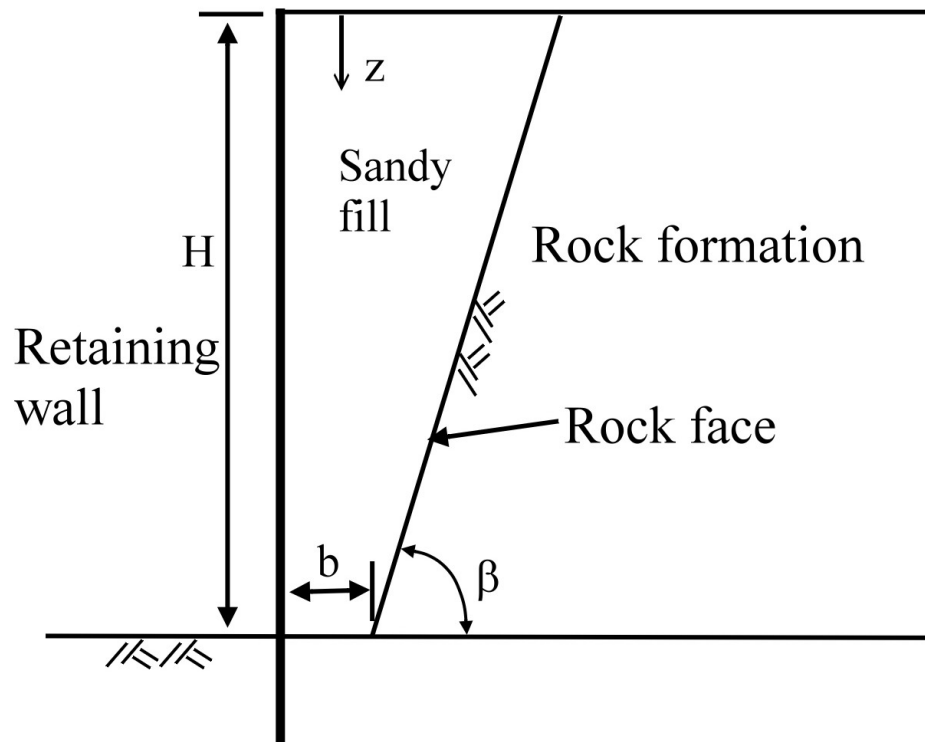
Typical geometry of backfill zone behind a retaining wall used in this study (after Fan and Fang, 2009)
